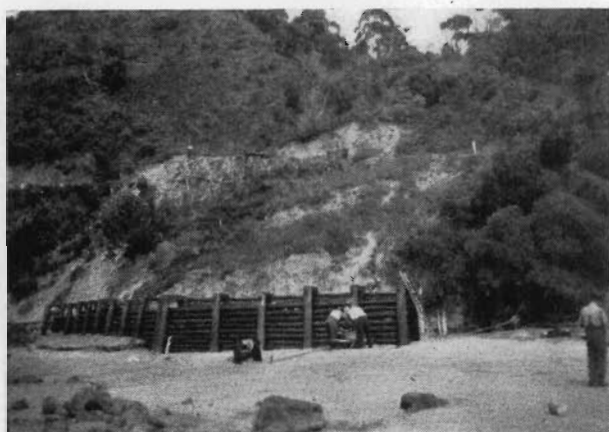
Ocean Road. Log-crib wall at toe of landslip at Eastern View.
